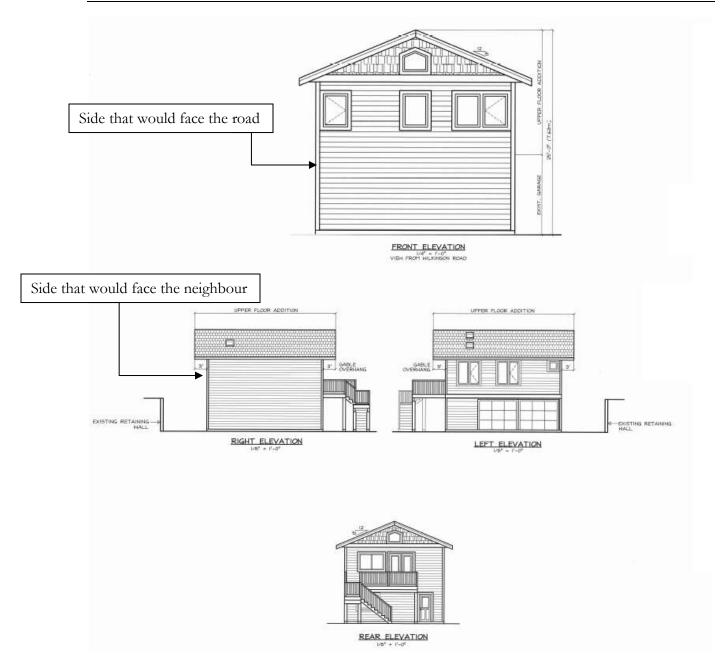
Conceptual Drawing of Proposed Accessory Building Submitted by the Applicant
